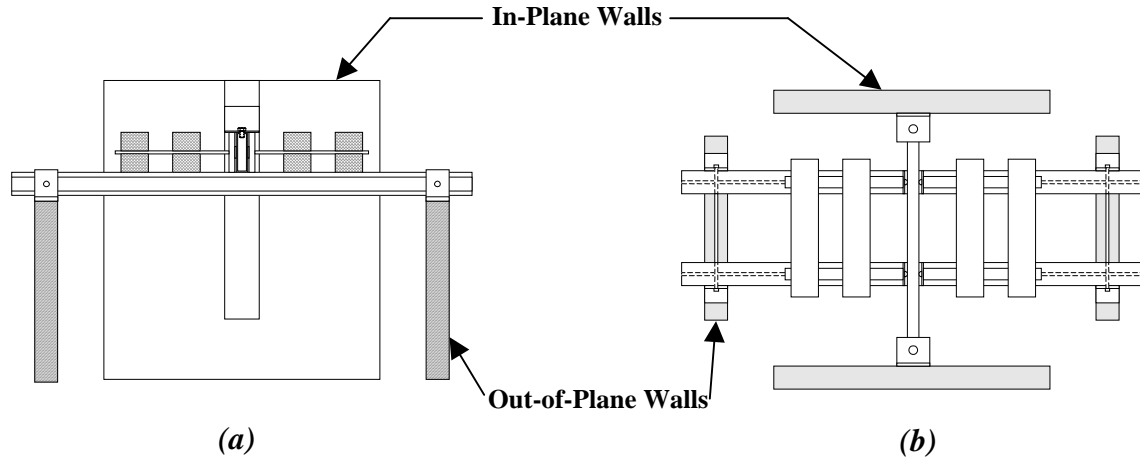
Schematics of the ST-10 Test Structure; (a) Elevation View, and (b) Plan View
